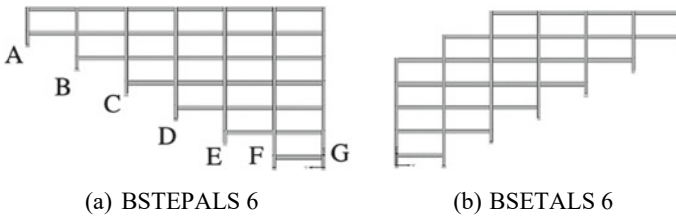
Bare frame models; a stepback configuration and b stepback-setback configuration
